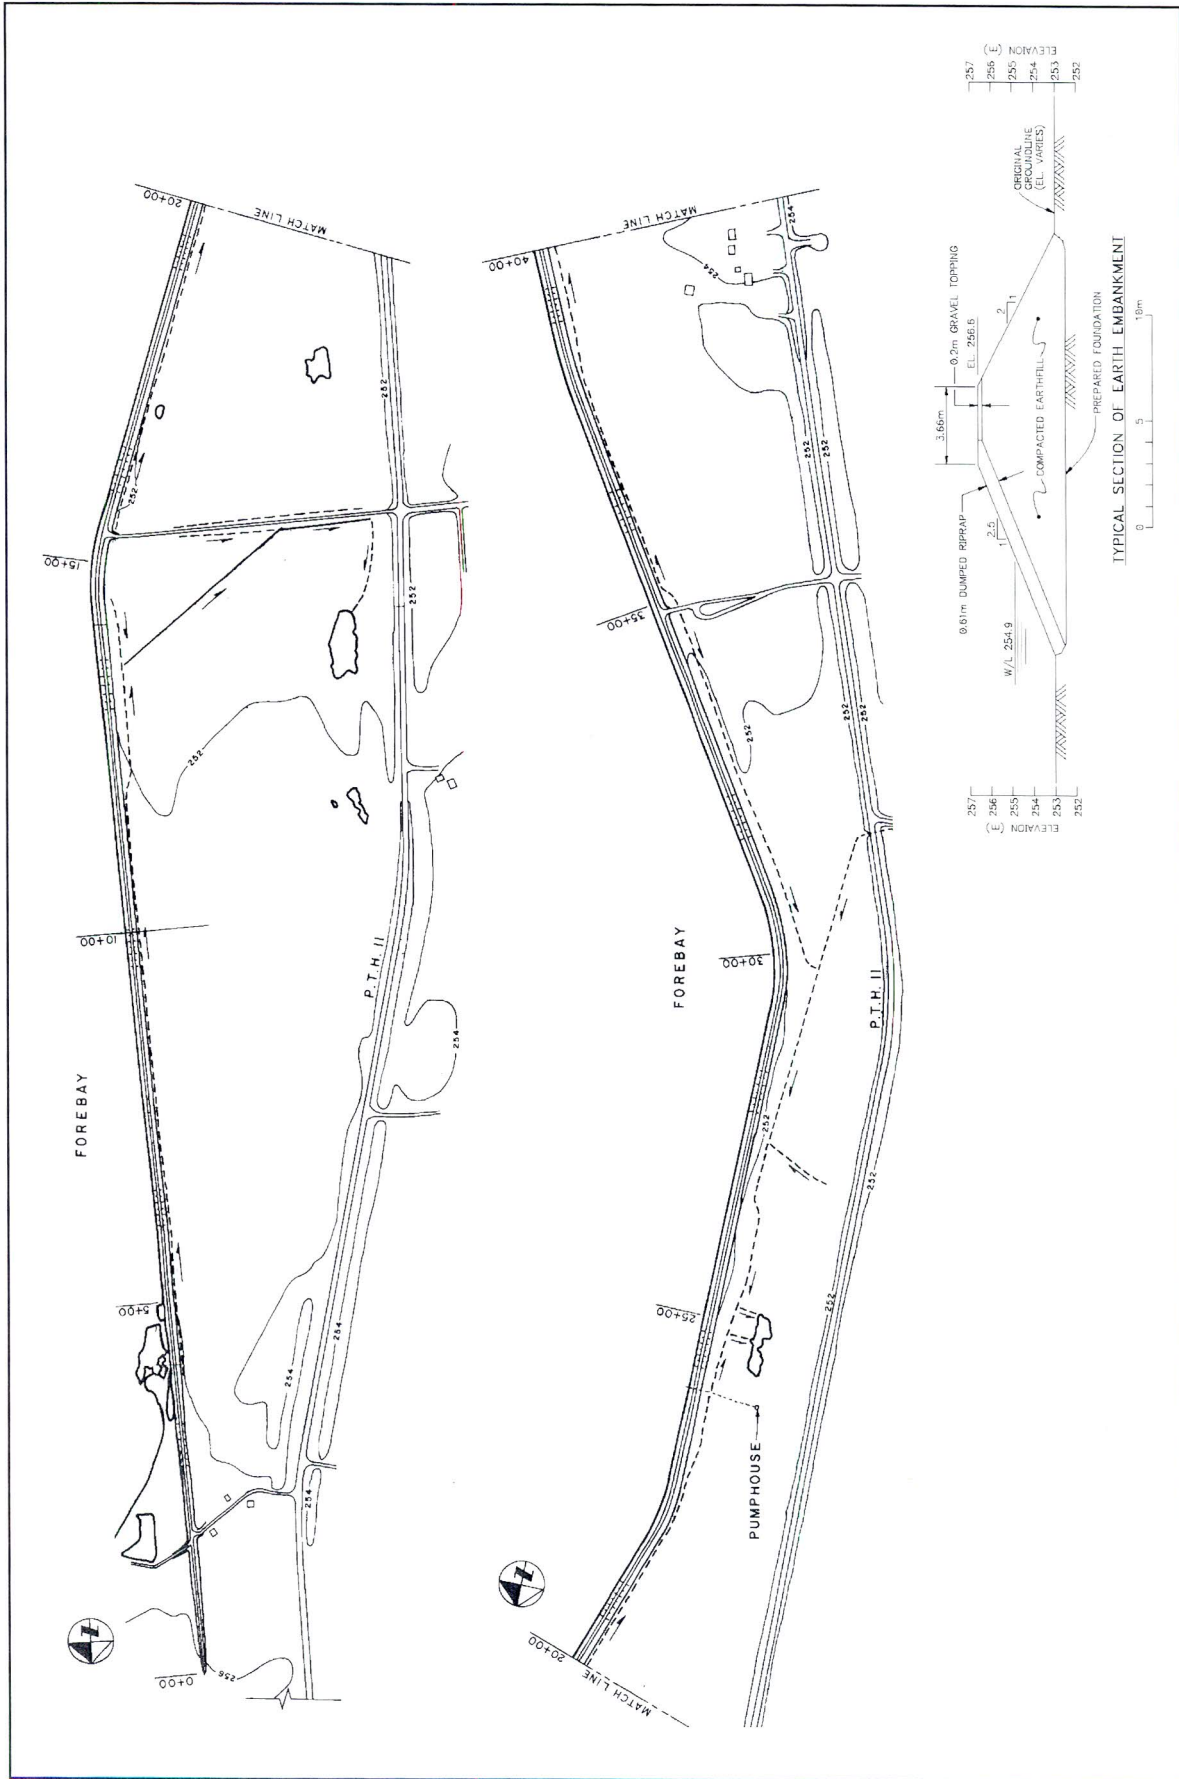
17W Dyke - Plan and Typical Cross Section
